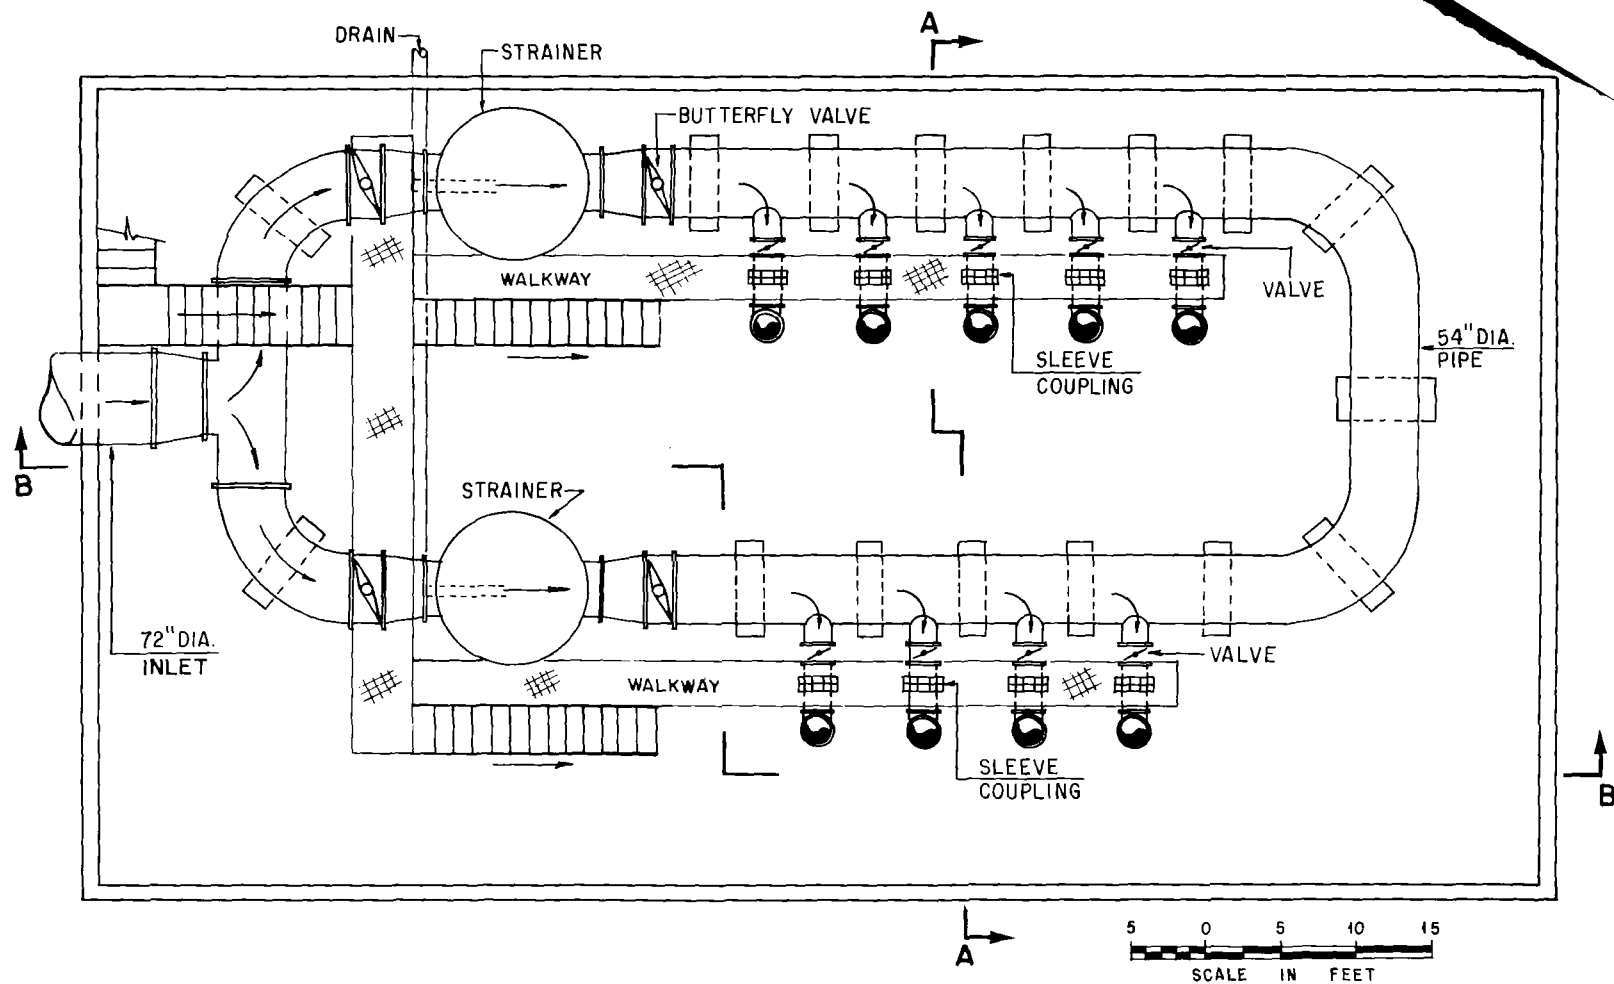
OROPOUCHE RAW-WATER PUMP STATION – PLAN AT ELEVATION 176
